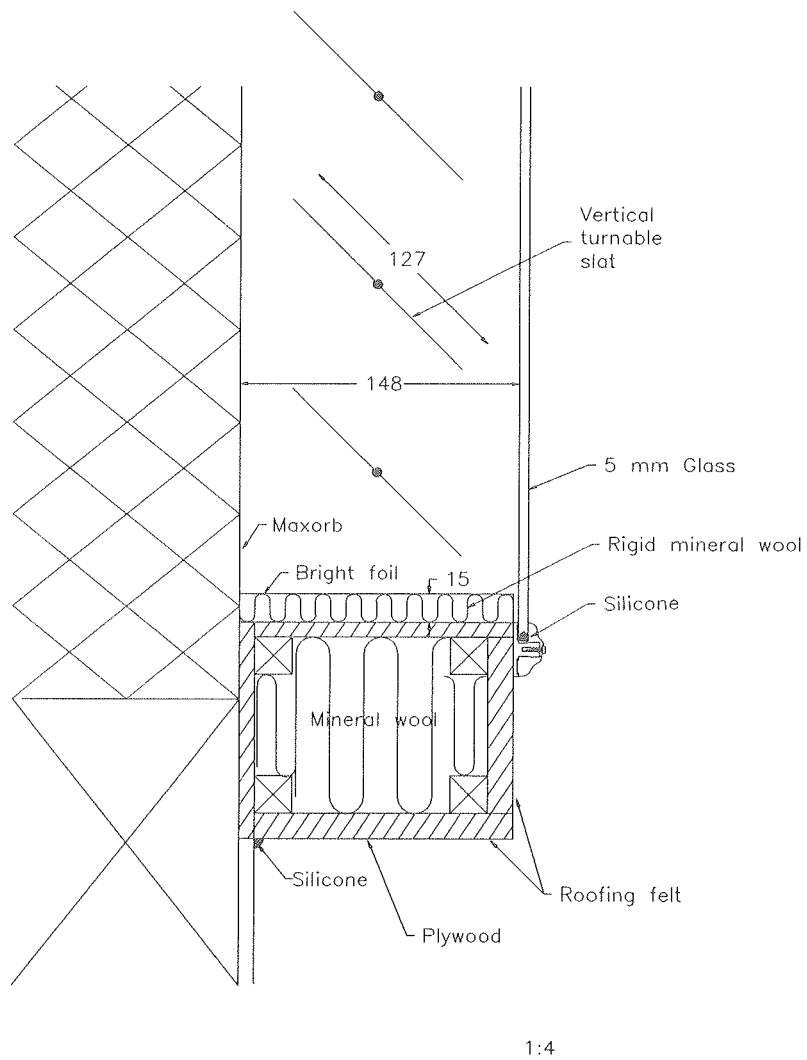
Horizontal section. Details of the side of the solar wall with the blind.
